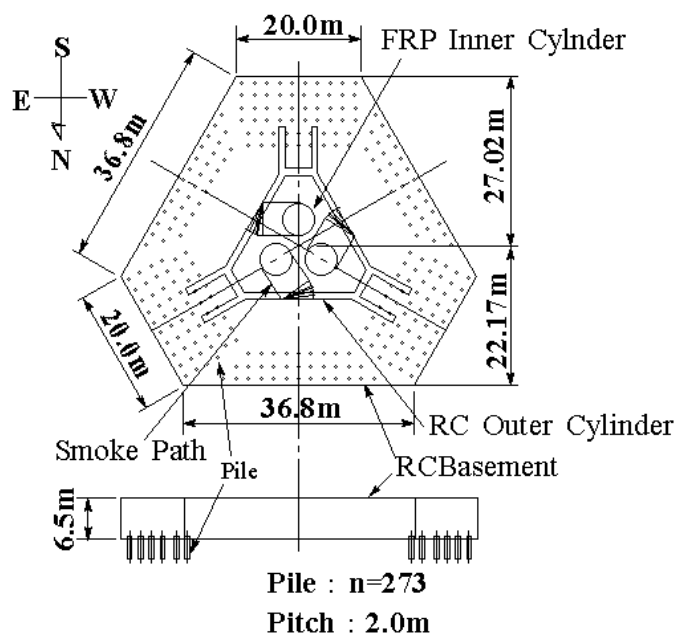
Plan and side views of the basement and the arrangement of 273 piles
